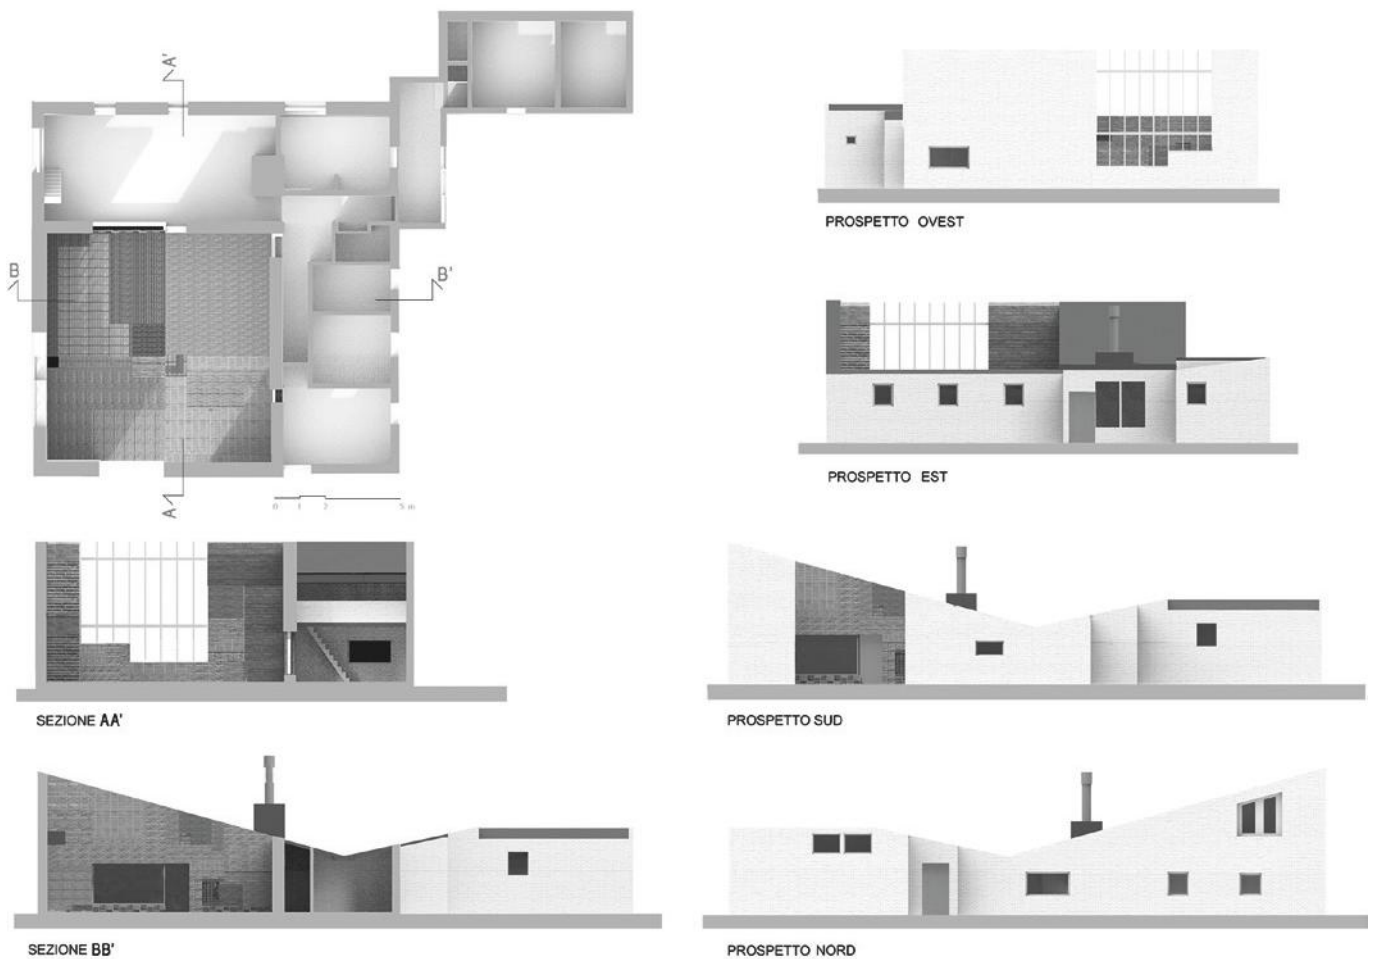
Plan, sections, and front views elaborated for Muuratsalo House by Alvar Aalto. Source: images created by the authors.
